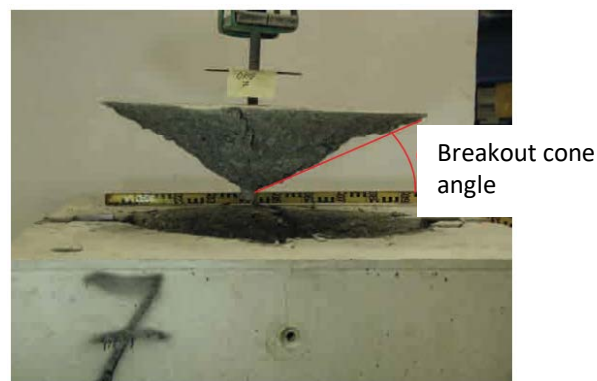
Concrete breakout in tension failure surface (adapted from Eriksson and Gasch 2011)
